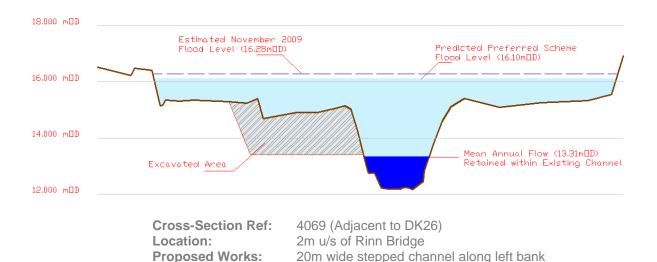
Proposed Works Channel Works from Rinn Bridge to the Rahasane Turlough
